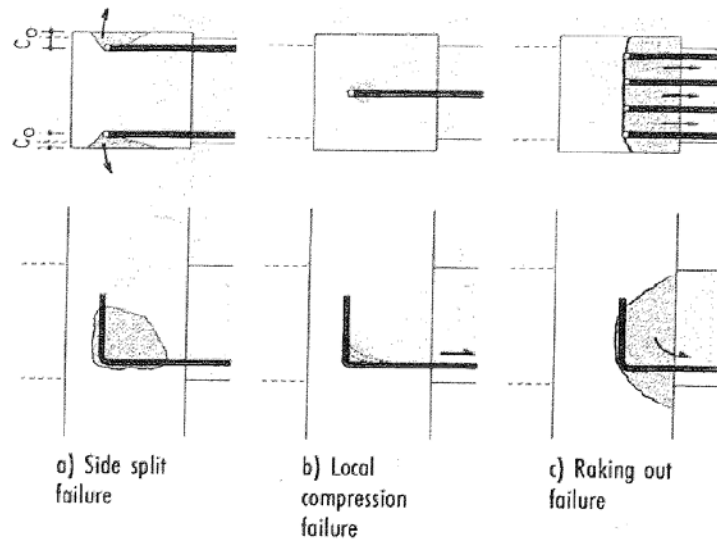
Failure modes for beam-column joints (figure from Joh et al. 1993)
